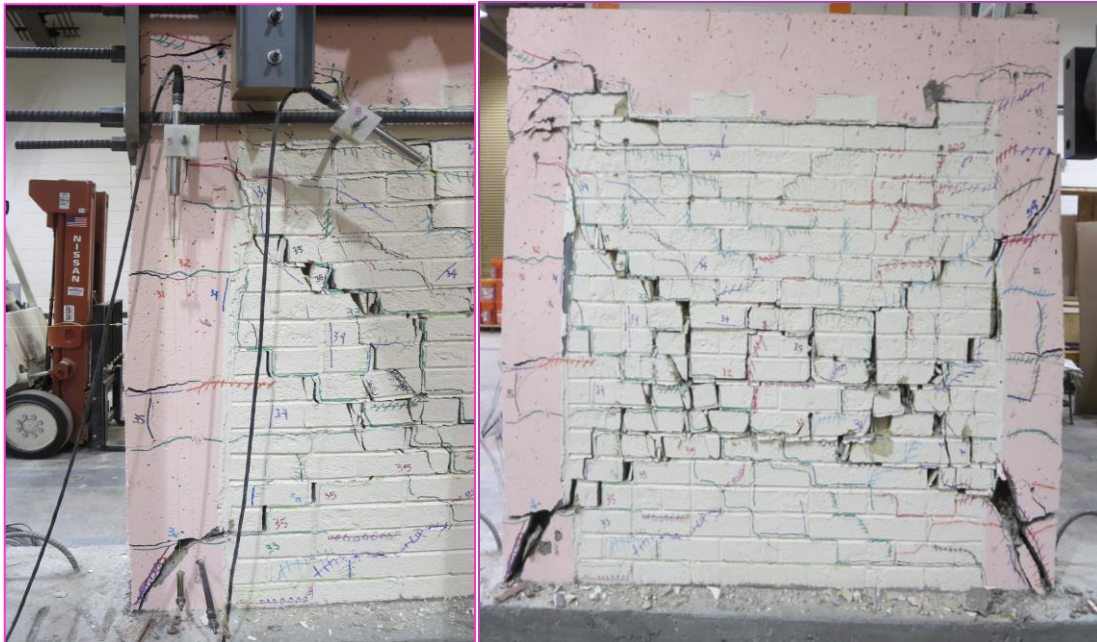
CM shear wall 2 failure mechanism
